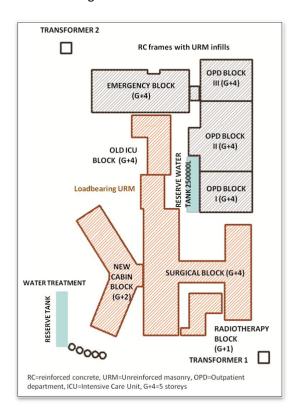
Site Plan adapted from John Sanday and Associates, Pvt. Ltd.
